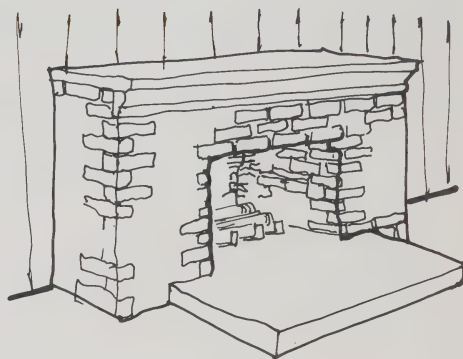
TYPICAL BUILT-IN MASONRY FIREPLACE.
